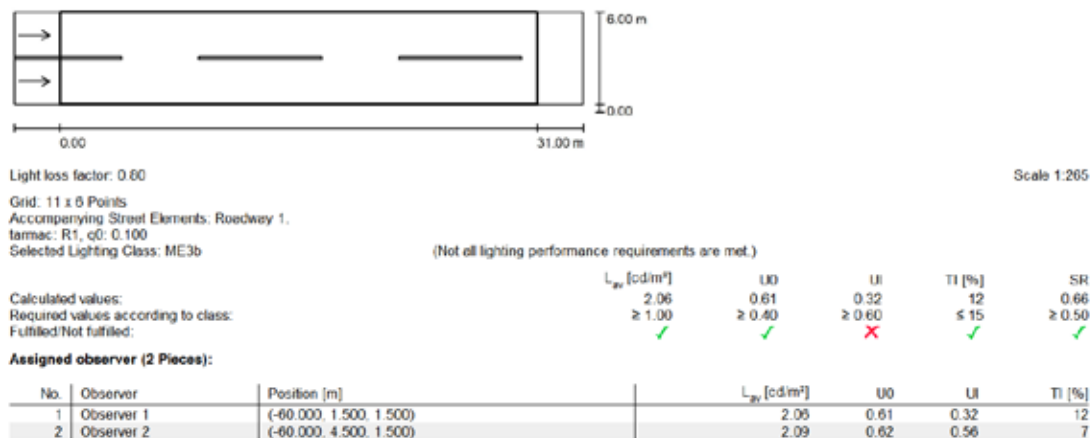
Existing street lighting calculation – Hrvatskih Branitelja street – segment 2
